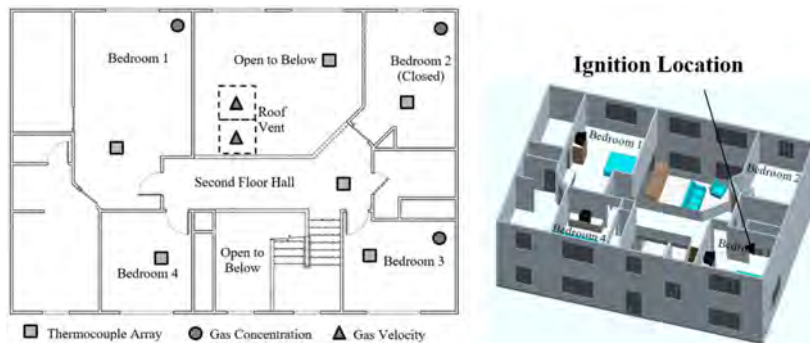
Two-story house second floor plan and 3D rendering showing furniture and ignition location.
